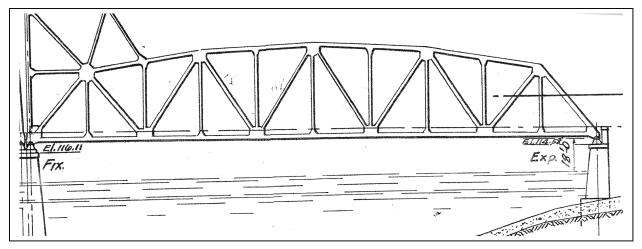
Flanking/Tower (Warren) Truss (NHDOT) [For full plan see Figure O-7]
